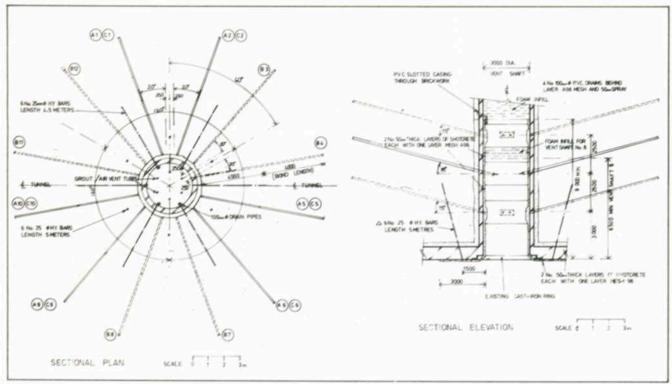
Details of Anchor arrangement, Summit Tunnel, Shaft 9. (Extracted from James Williamson & Partner's Drawing)
